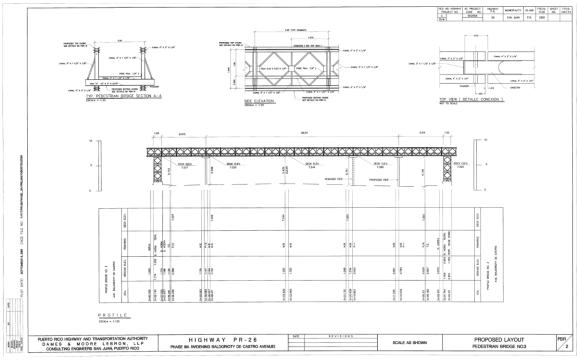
Bridge Drawings 2001 – Sheet 2
